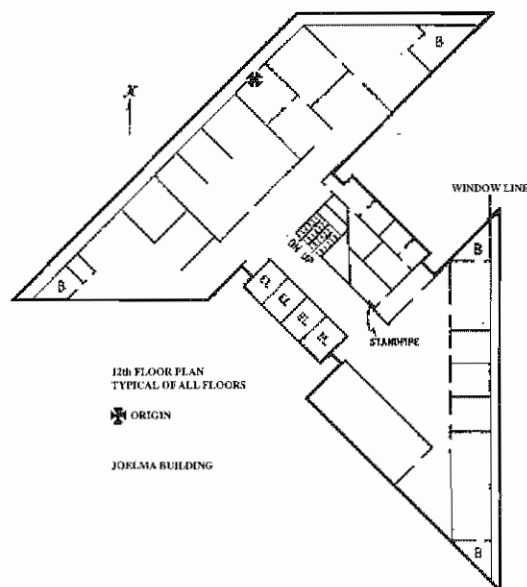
Typical Office Floor Plan – Joelma Building (from Sharry, 1974)
